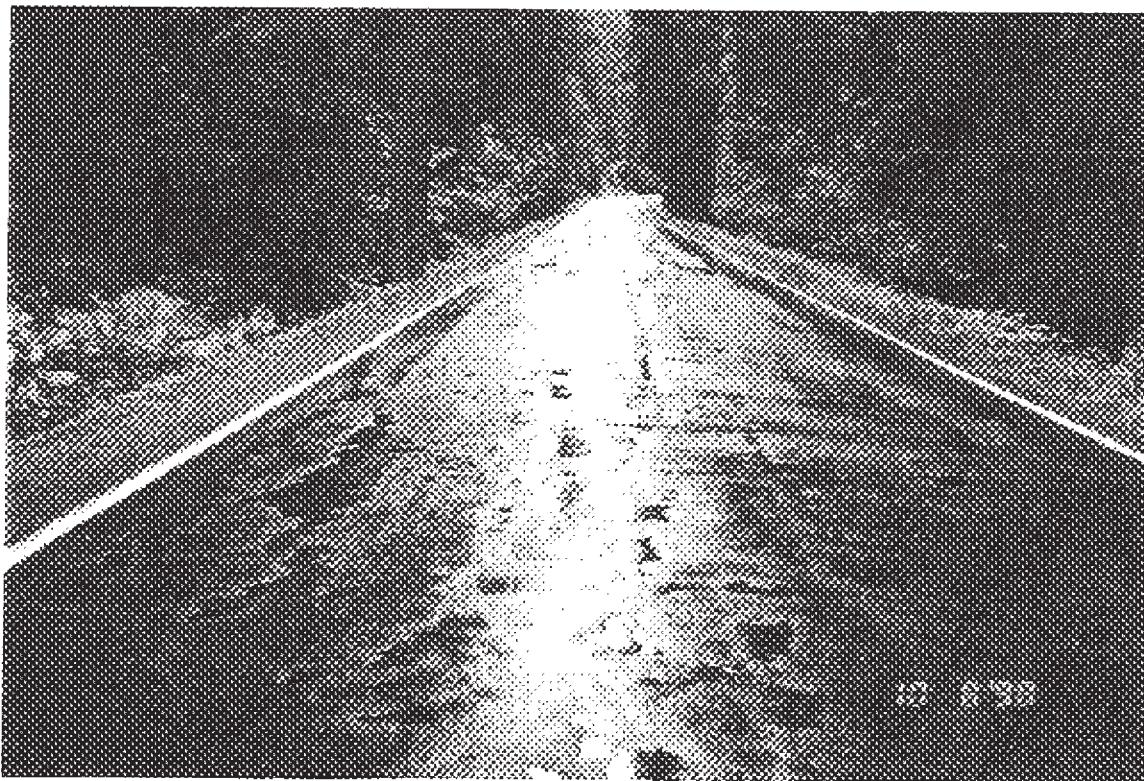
MP 3.80 - Localized distress and blade patch
